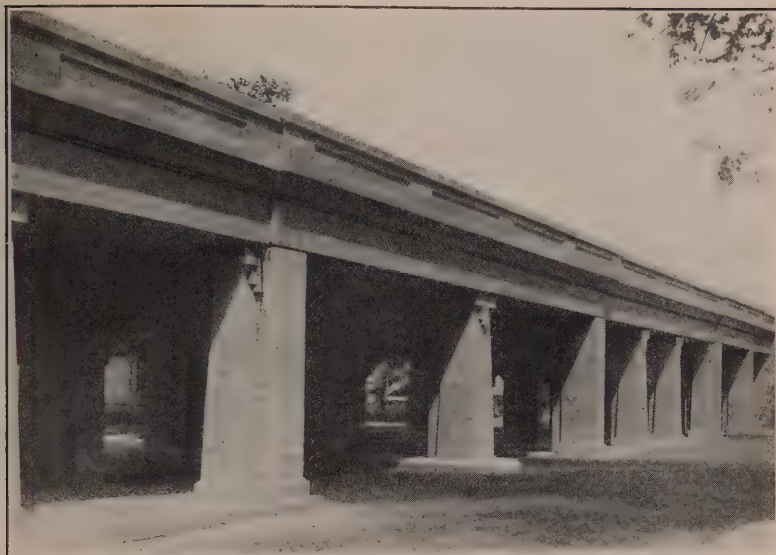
Plate XIV. Reinforced Concrete Slab Bridge. Typical of 1915 Construction.
